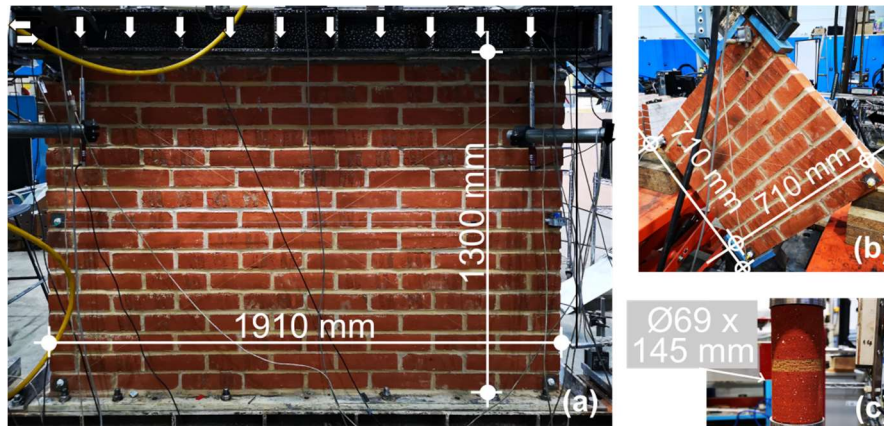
Specimen details: a) large scale walls, b) diagonal panels, c) cylindrical cores
